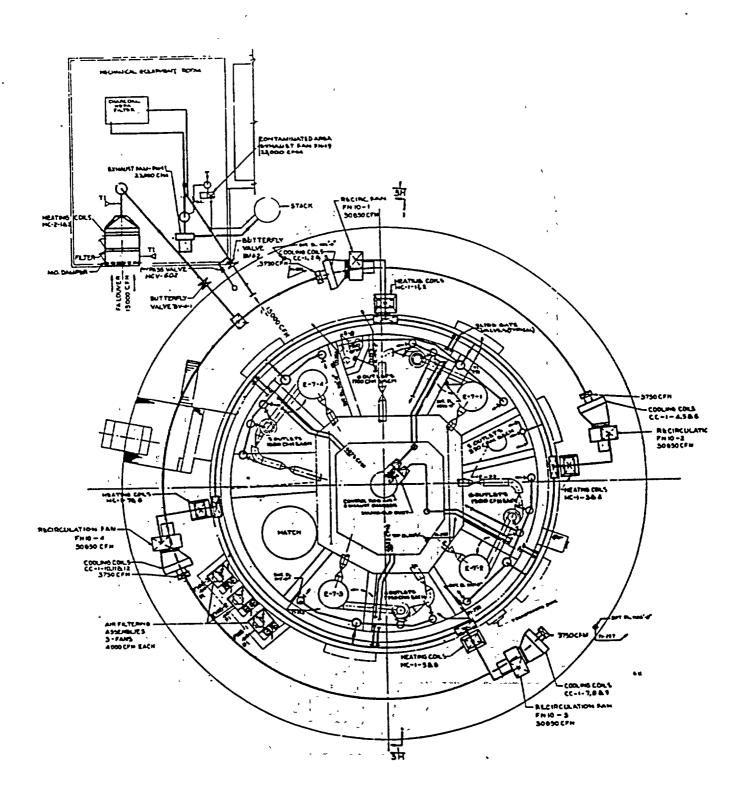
Plan View of the Yankee-Rowe Large, Dry Containment (Steel Sphere)
